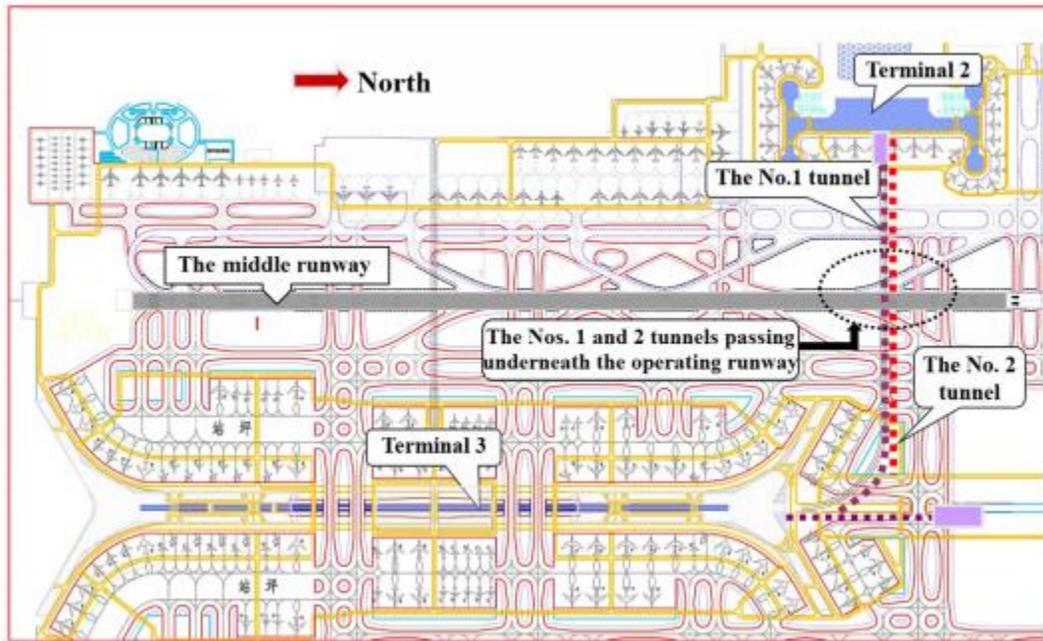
Plan of Twin Tunnels and the Middle Runway
